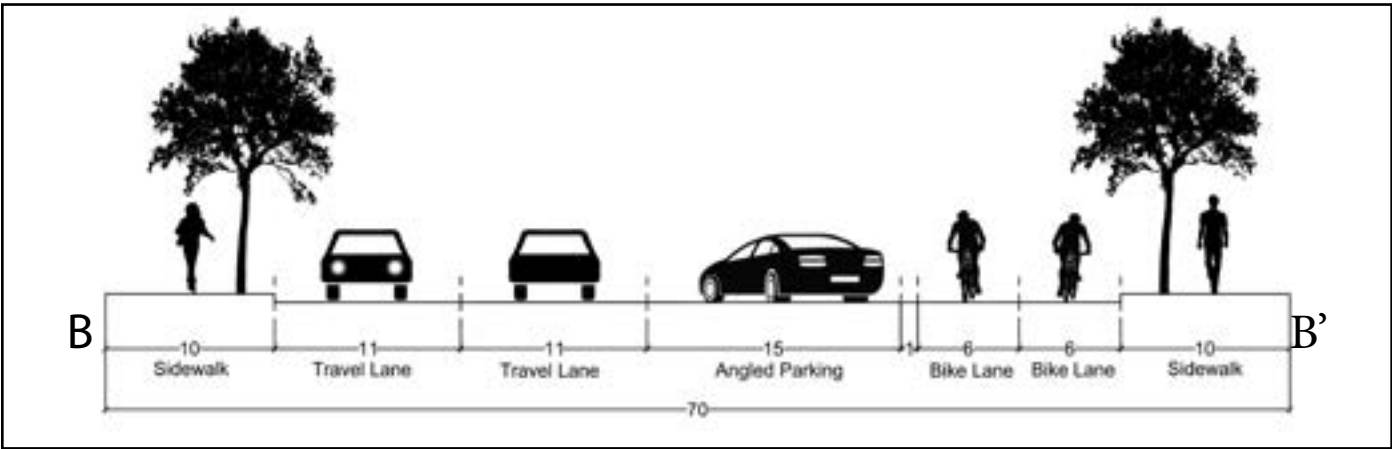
Example Atascadero Road Cross-Section B'-B
